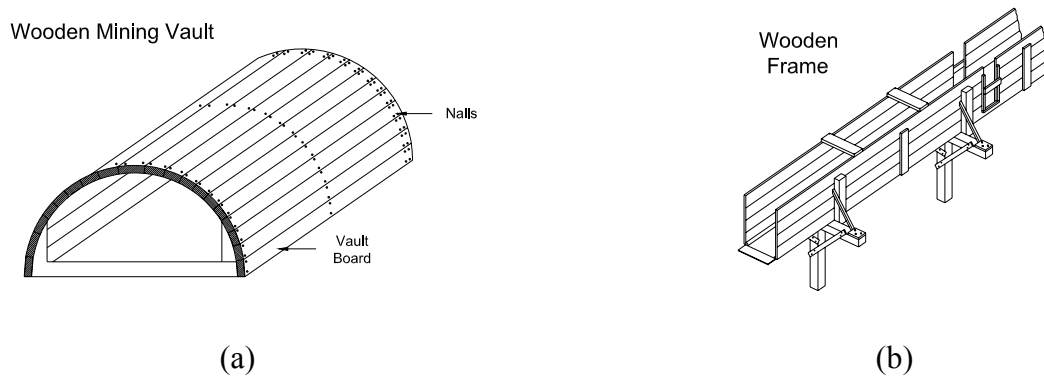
Timber structural systems transversely loaded along their length: (a) wooden mining vault, and (b) wooden frame.
